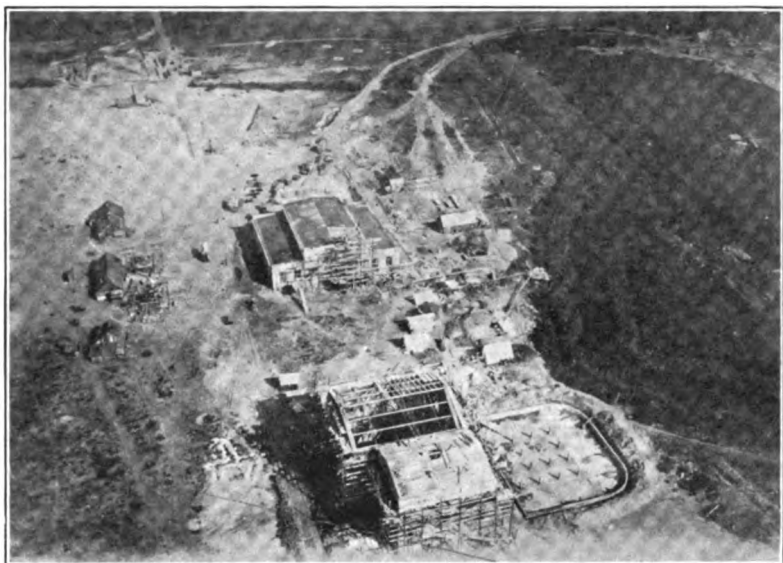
Aerial View of Radio Building and Power House Taken From Top of Tower Nearest Station; Taken During Construction of Buildings
